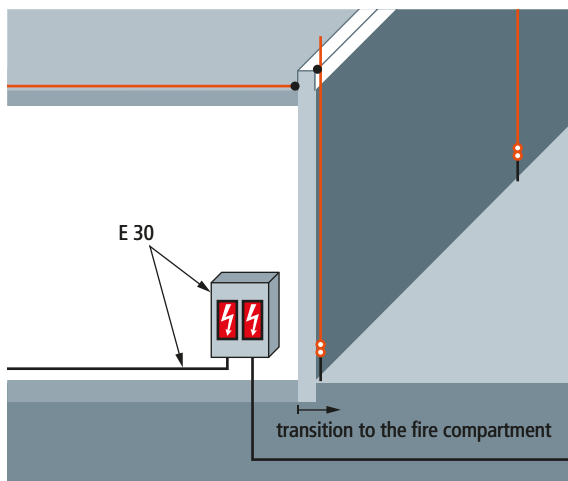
Lightning equipotential bonding at an E 30 line in an E 30 distribution board (inside of the outer wall)
